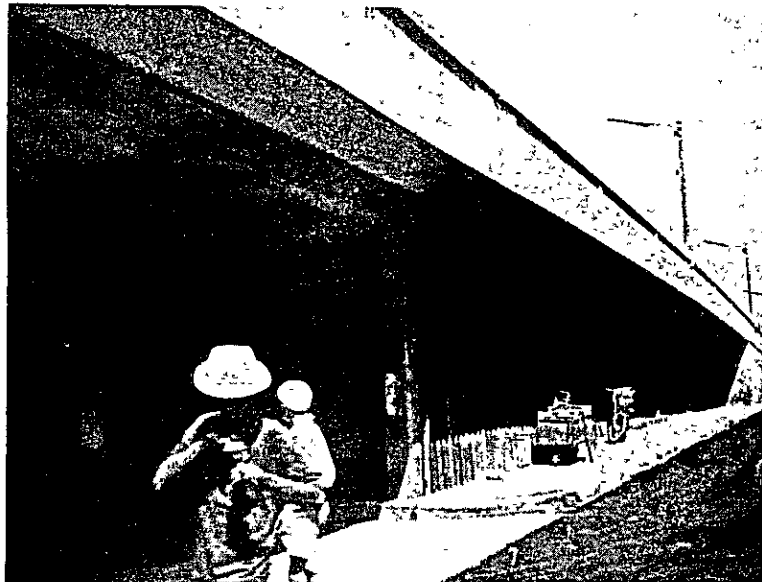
6 Span Continuous RC Rigid Bridge
